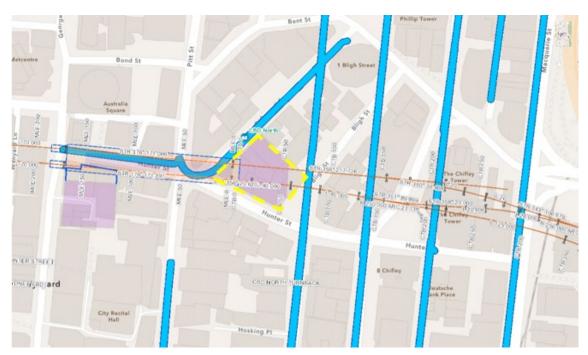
Bennelong Stormwater Channel – plan of underground layout with site highlighted in yellow.
